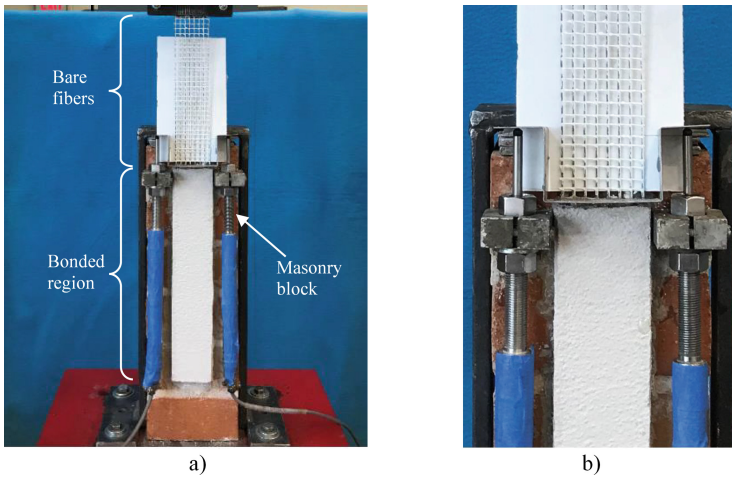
Single-lap shear test: a) photo of SRG-masonry joint specimen, b) close up view of LVDTs at loaded end of the SRG composite and bare fibers outside the bonded region.
